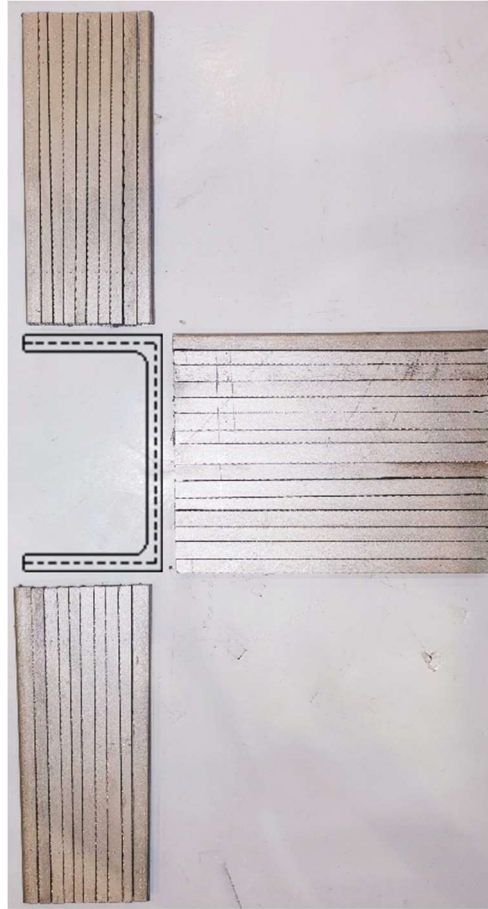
Typical sectioned C 150×75×6 specimen.
